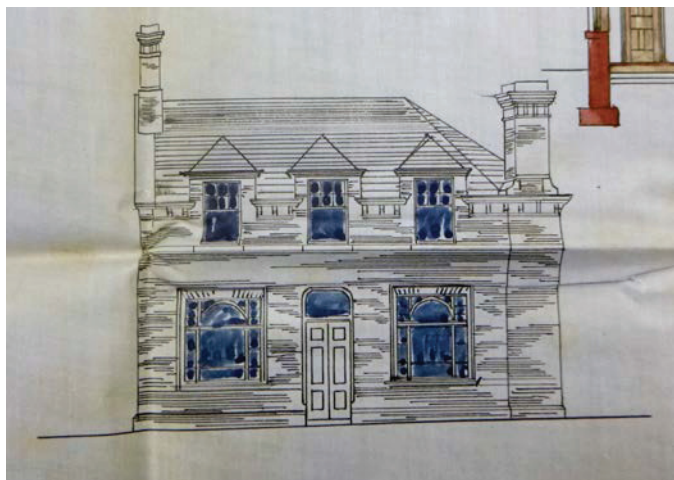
(left): Elevation to Hart Street for proposed alterations, 1894
